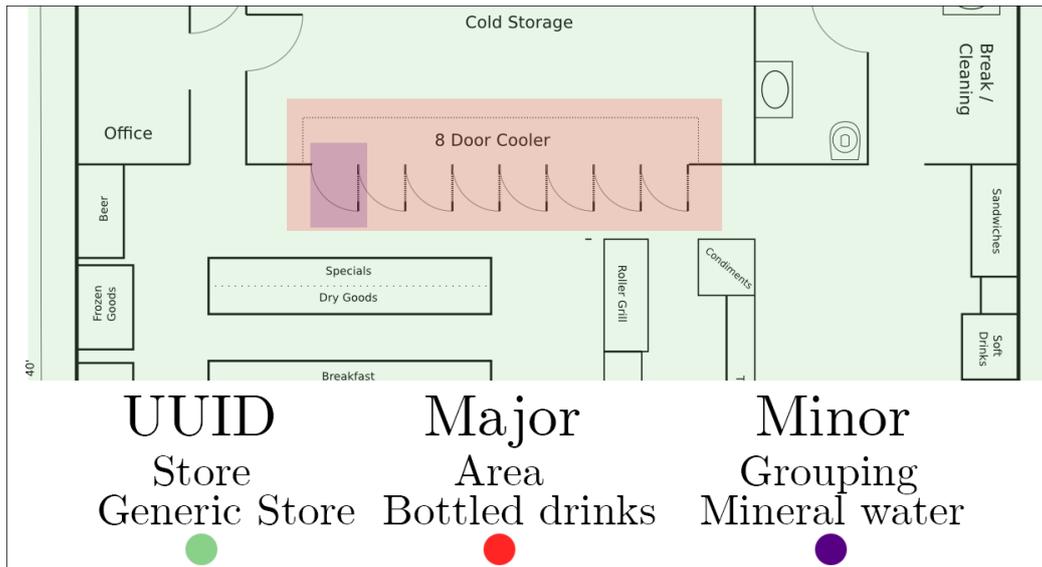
Floor plan visual example of how one can divide the store into sections
